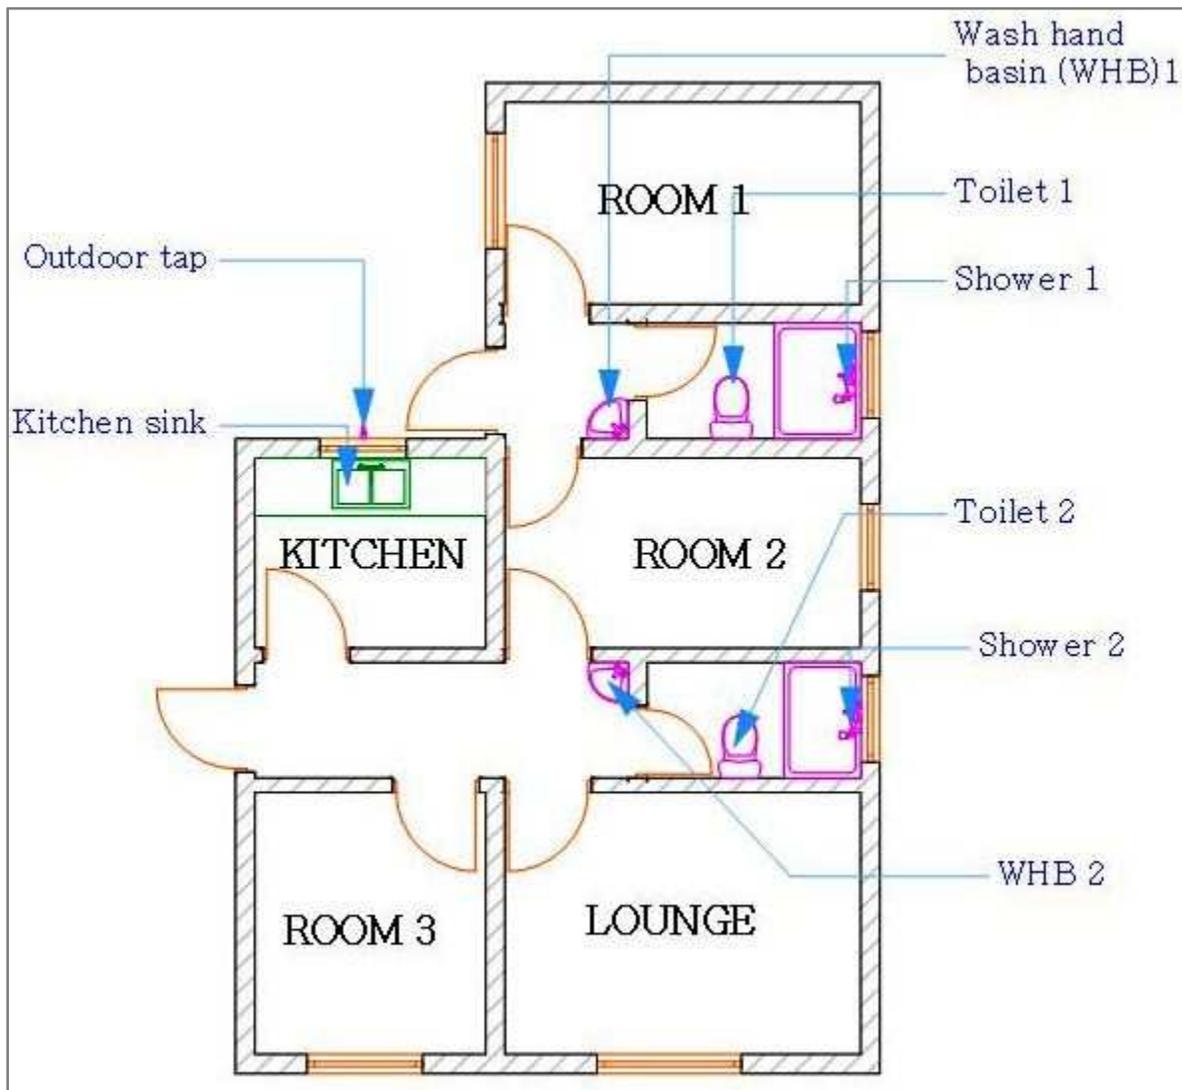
The rough sketch of the plan of the typical Imara Daima house
